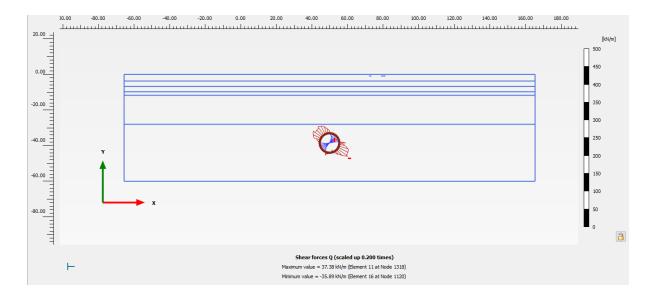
Shear force diagram of tunnel (CASE 2 – Tunnel under center of the road)
